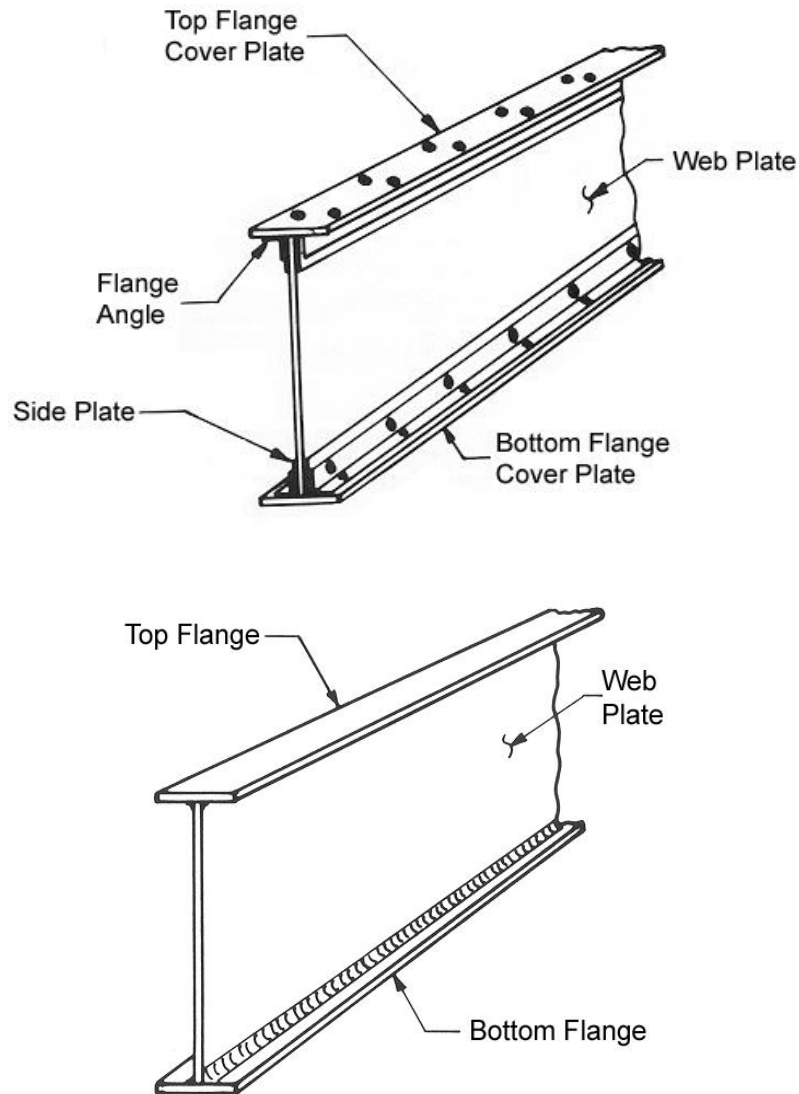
Built-up Steel Plate Girders (Top), Rolled I-beam Girder (Bottom) (Ohio Department of Transportation, 2008)
